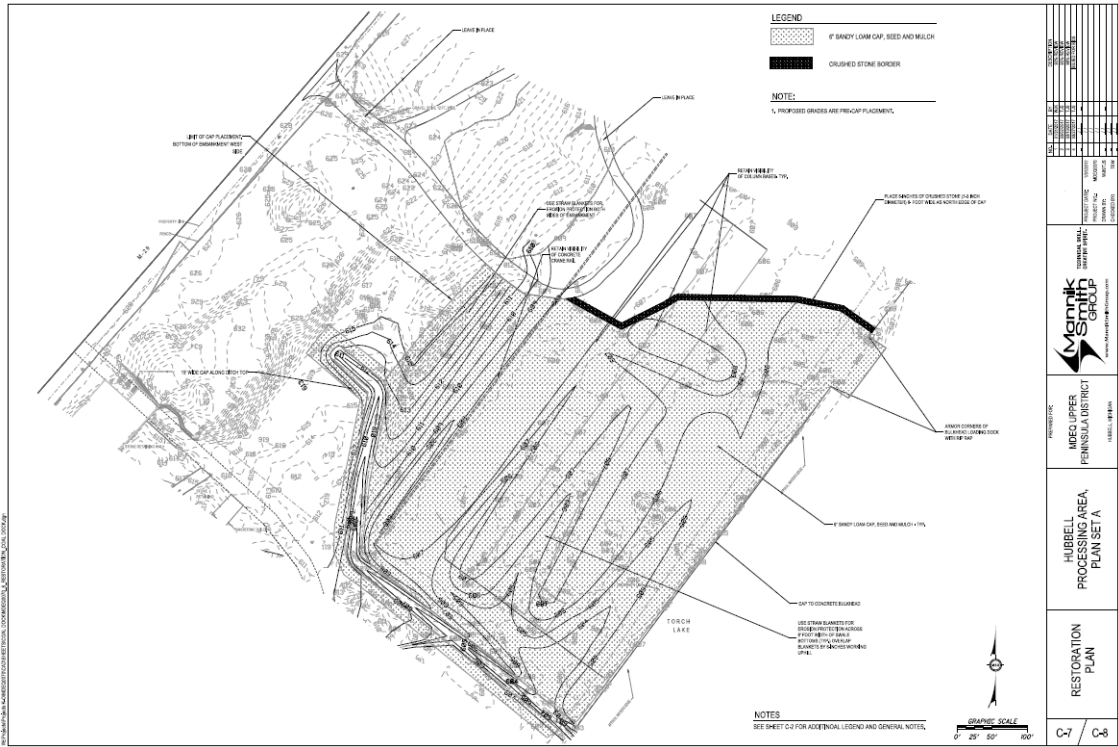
MSG Hubbell Processing Area Drainage Ditch Restoration Plan [18].
